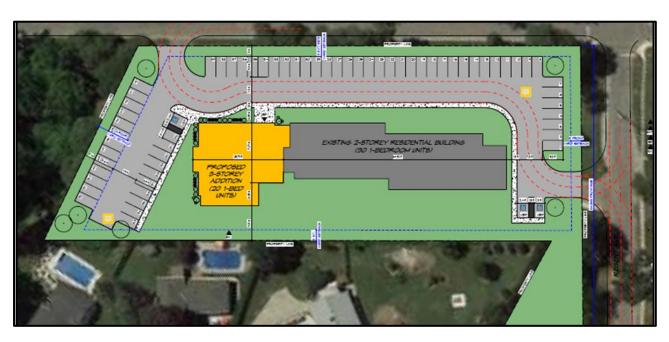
March 1, 2023 Concept - Aerial View (revised with additional space planning requirements)
